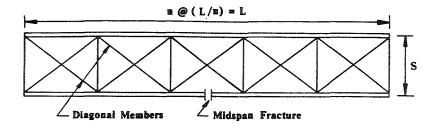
Plan View of X-Type Bottom Lateral Bracing
